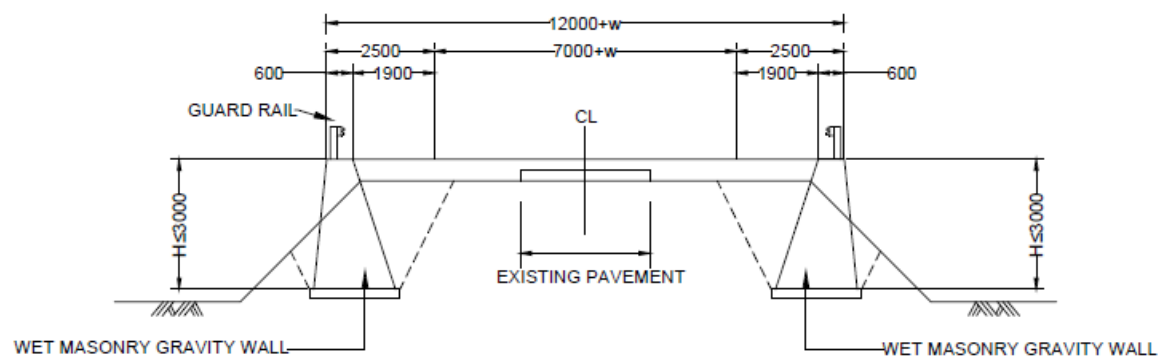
(2): Typical Cross Section – Type 2 (Plain and Rolling Terrain – Formation in Embankment)
